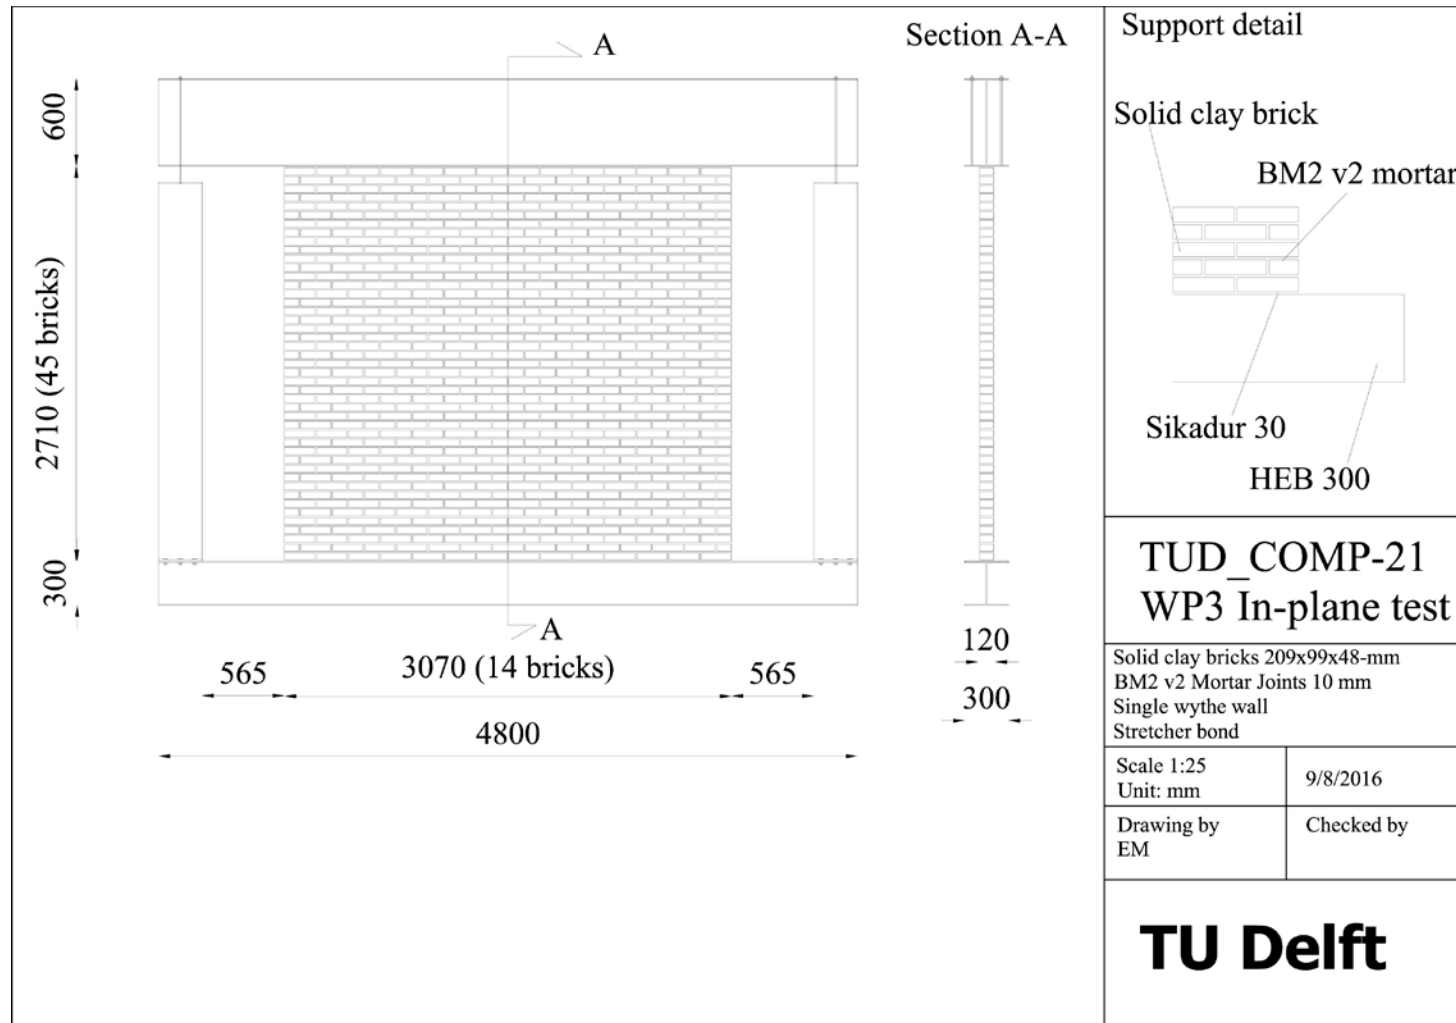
Drawing adopted for the construction of wall TUD_COMP-21. As built dimension in Table 19.
